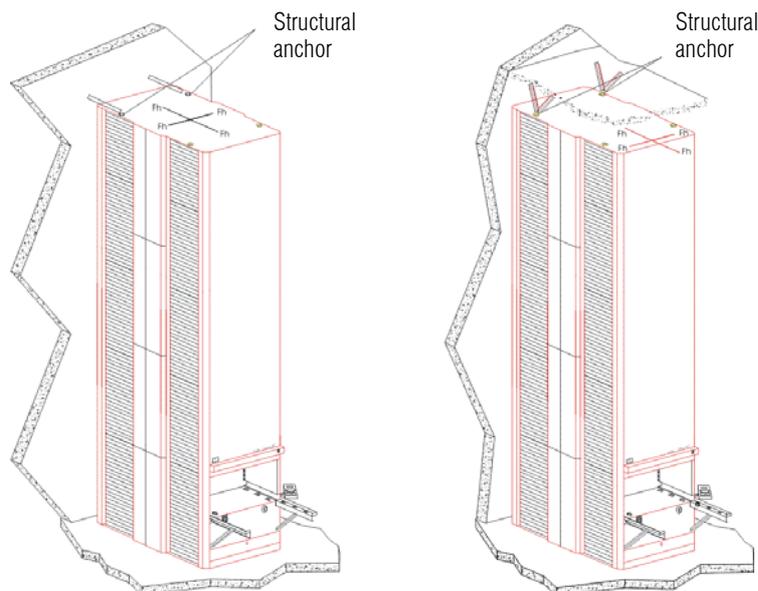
Reinforcement examples: structural anchors on the building ceiling
